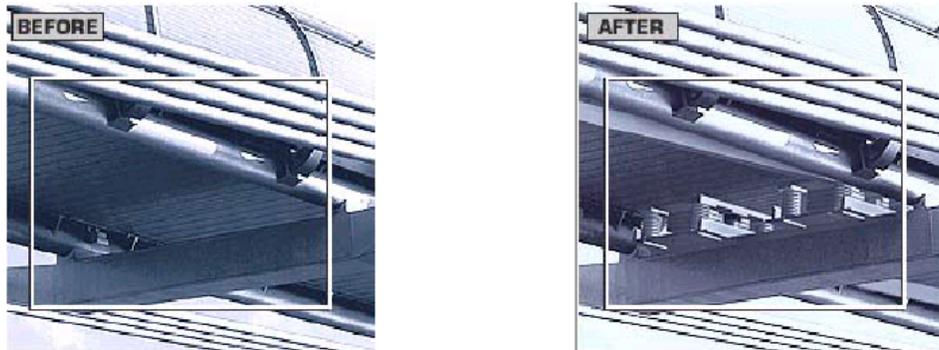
Addition of tuned mass dampers in The Millennium Bridge
